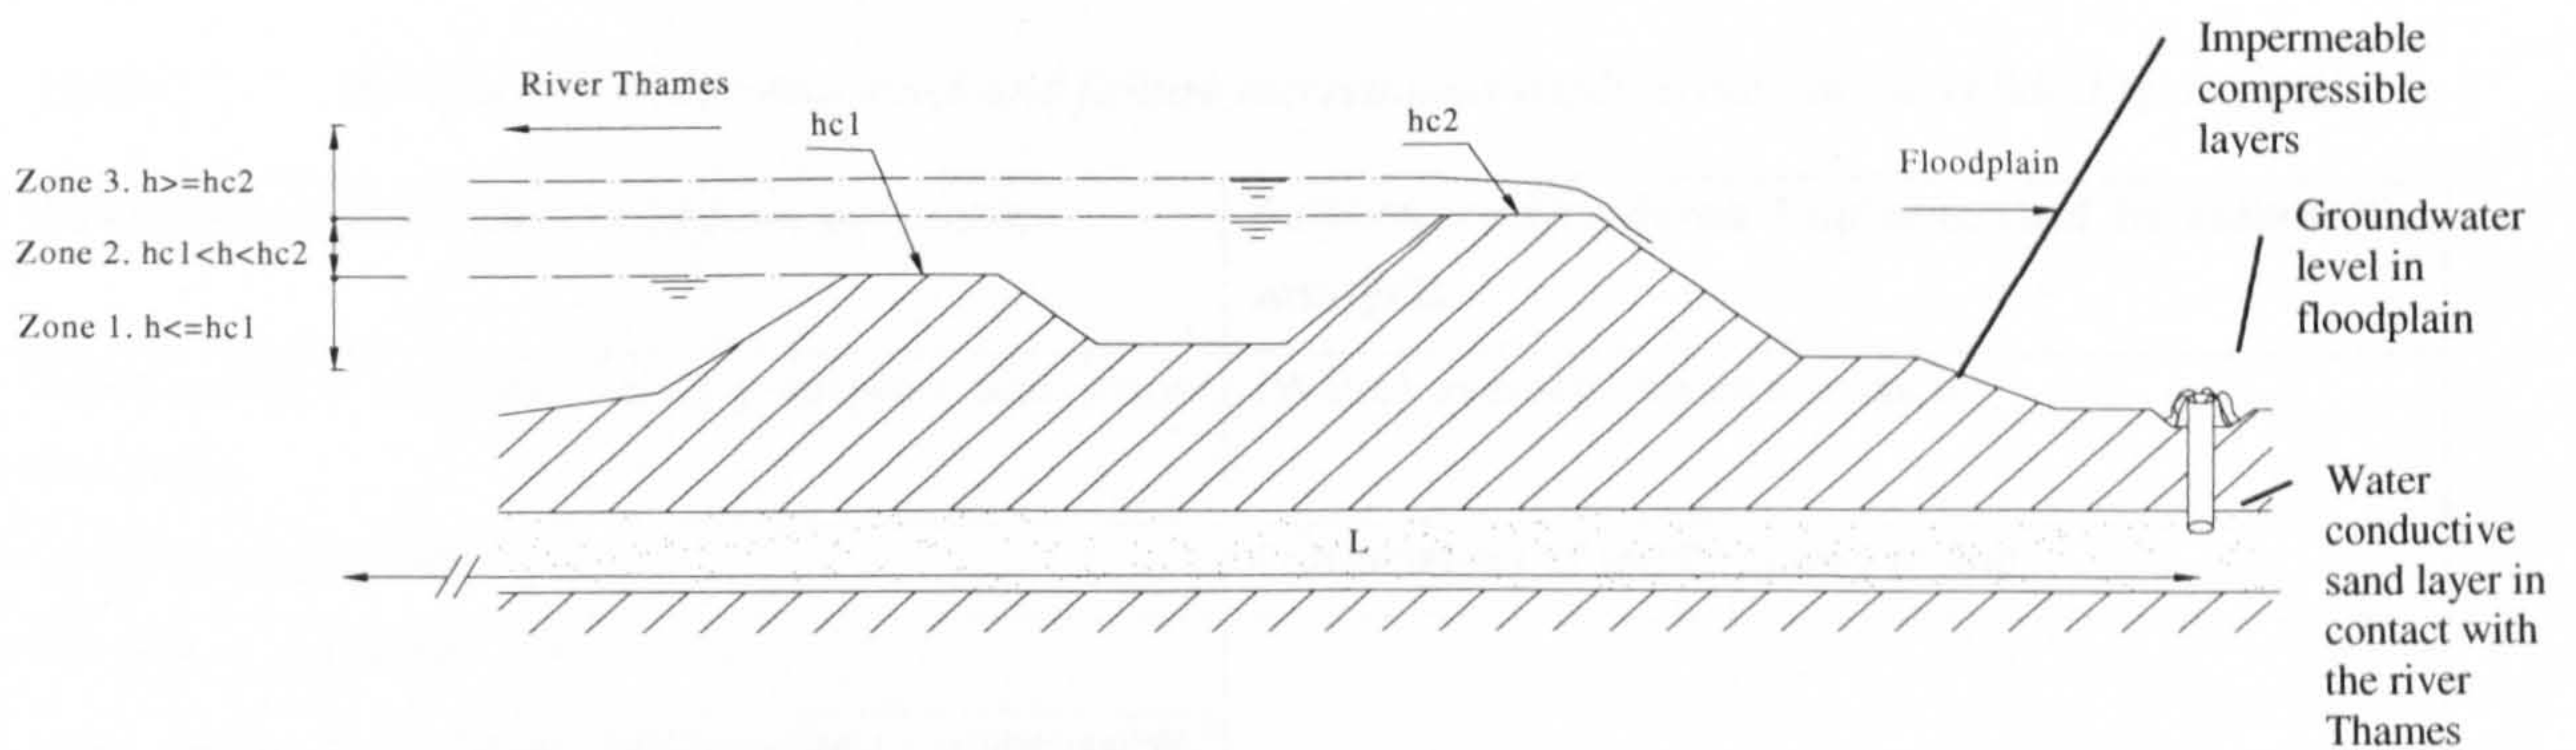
Typical cross section of earth embankments between Dartford Creek to Gravesend
